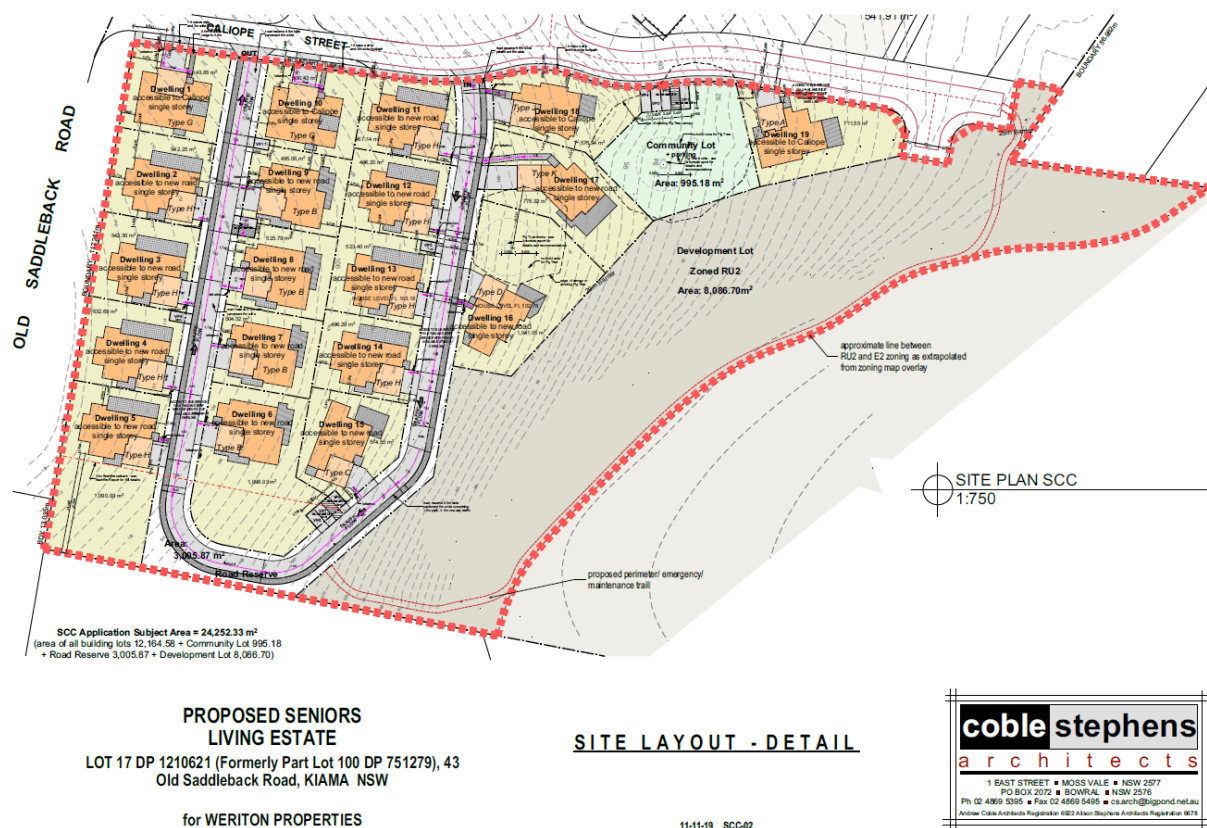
Excerpt detail site layout plan (Coble Stephens Architects 2019)
